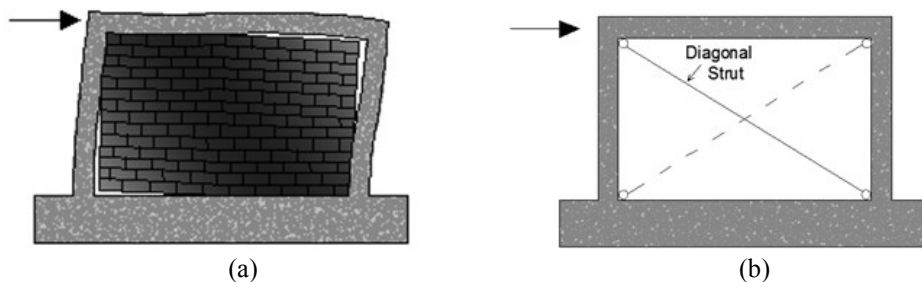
Details on the response of masonry infilled frames under in-plane loading; a)separation of the walls from the structural frame; b)equivalent strut model
